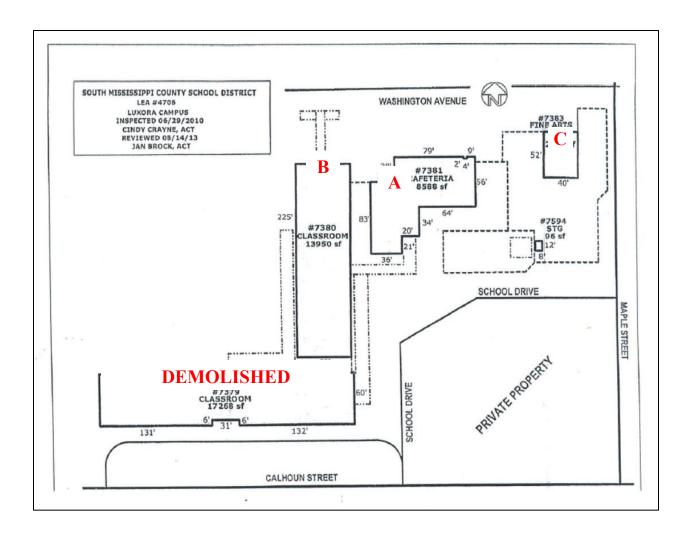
Site Layout 406 Washington Avenue Luxora, Ark. (Mississippi County)
